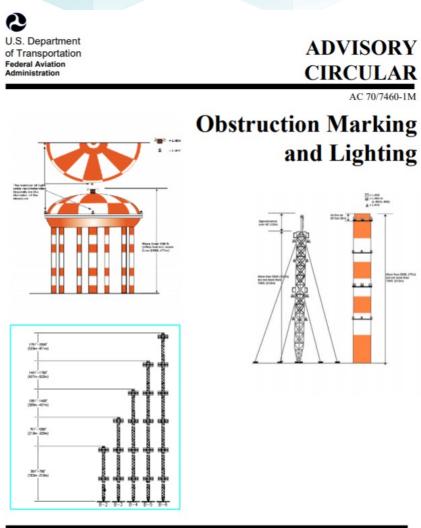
Painting and Lighting of Water Towers, Storage Tanks, and Similar Structures
